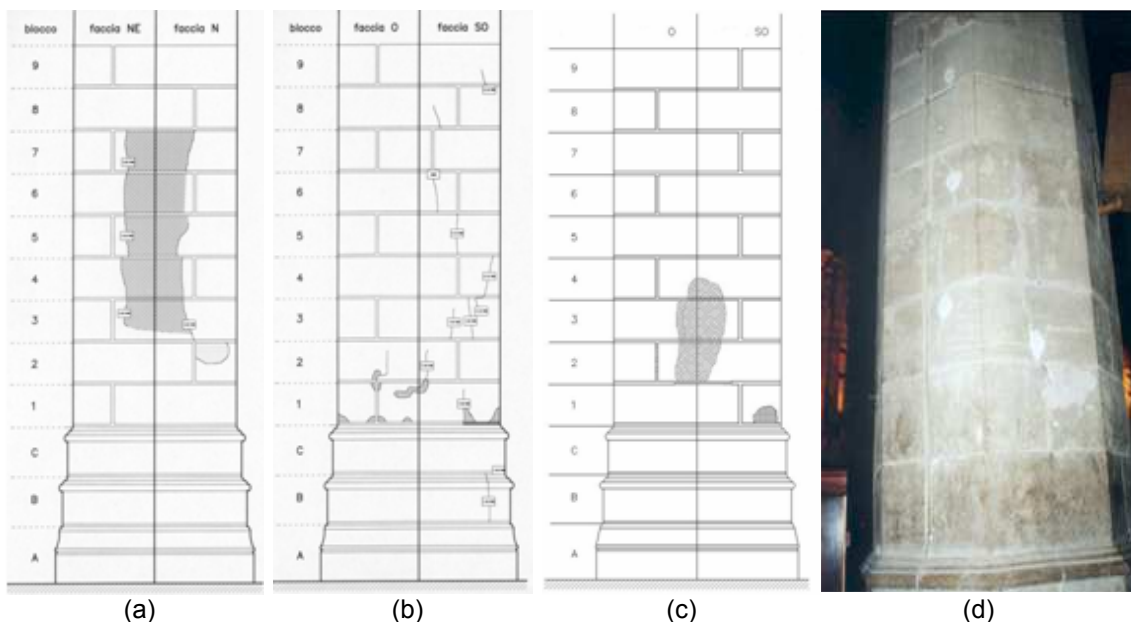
(a),(b),(c) Example of cracking of piers documented. (d) Photograph corresponds to the wedge developed at the pier face sketched left.
